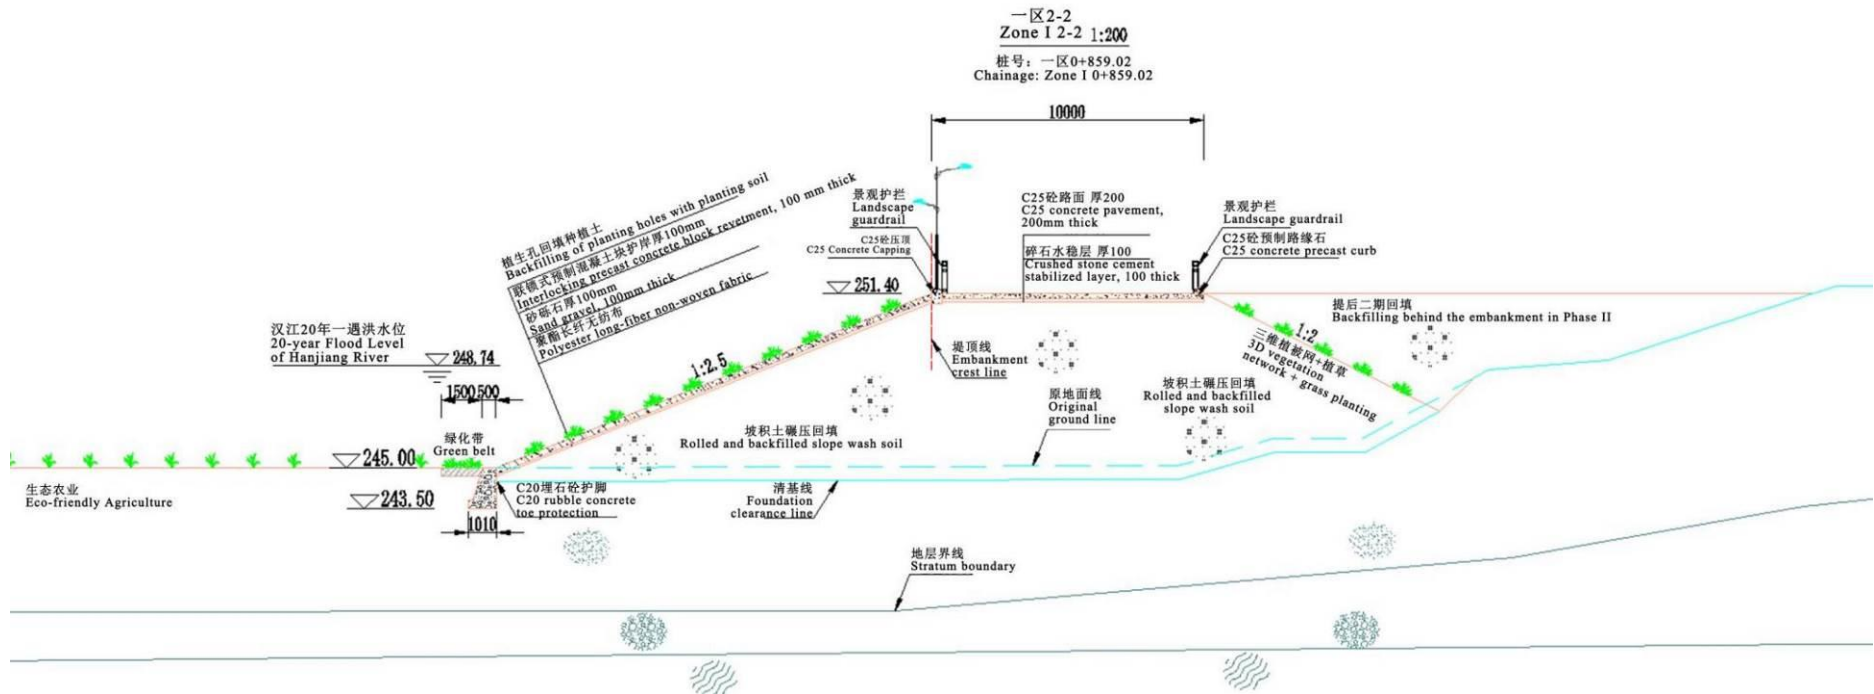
Form of Proposed Embankment in Protection Zone 1 (Yellow Sea Elevation)
